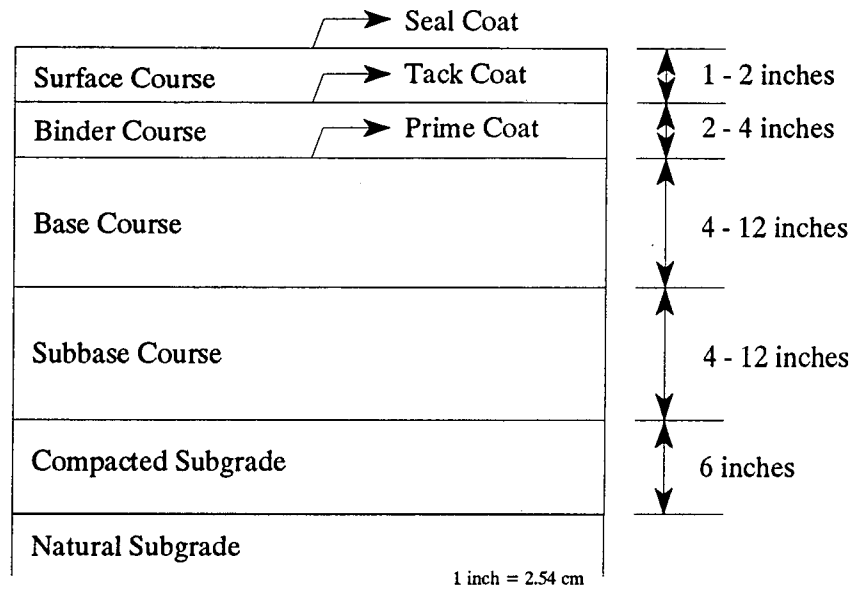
Typical Cross Section of a Conventional Flexible Pavement [Huang (1993)]
